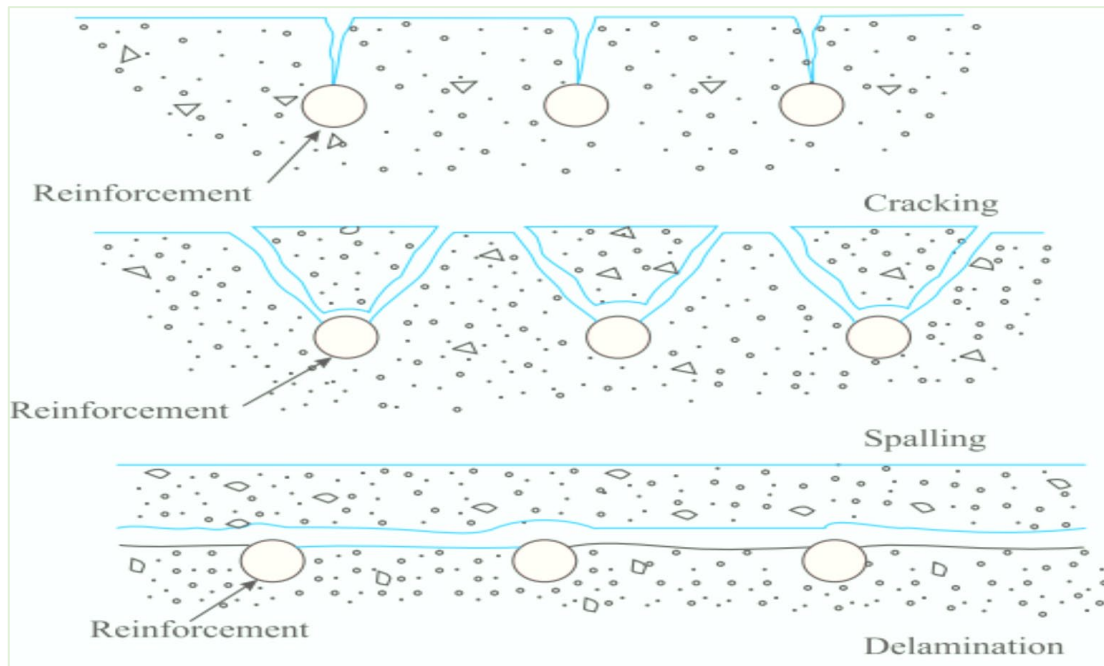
Corrosion damage on cracking spalling concrete structures (Shetty, 2005; Neville, 2011)
